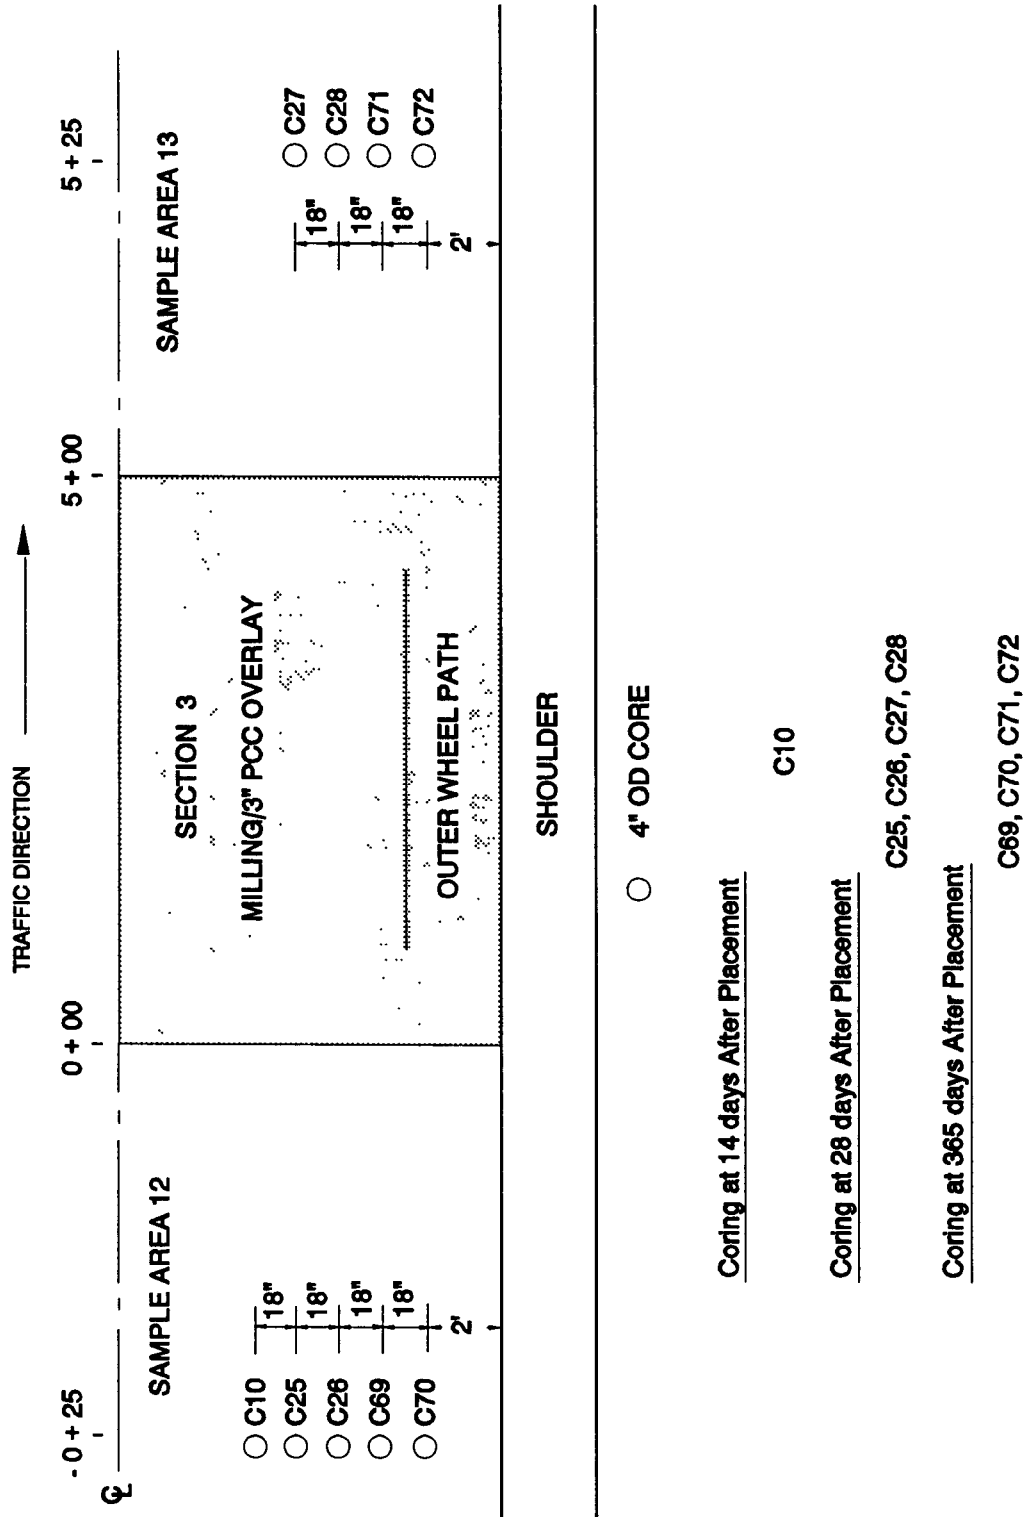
Example of "Post-Construction" Sampling Plan for Test Section 3
